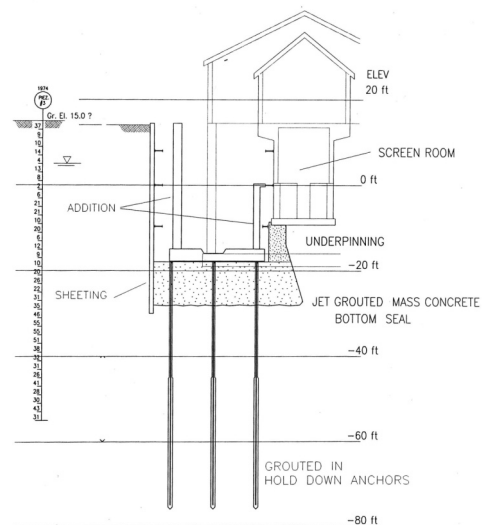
Excavation cross section with down-hole anchors and bottom seal
